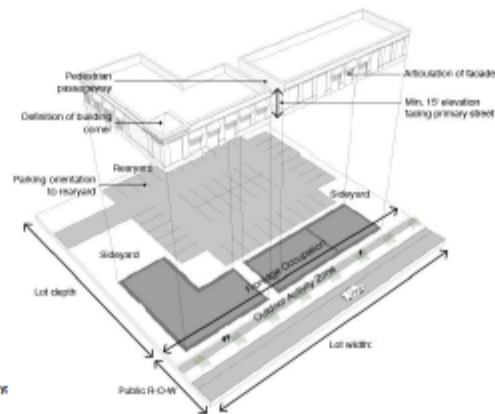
BUILDING AND SITE TYPES
